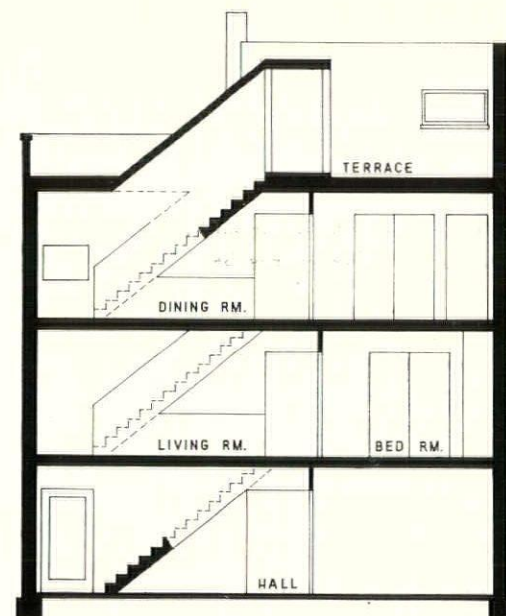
DETAIL SECTION, VERTICAL, THROUGH FLOOR, WALL, WINDOW AND ROOF TERRACE
